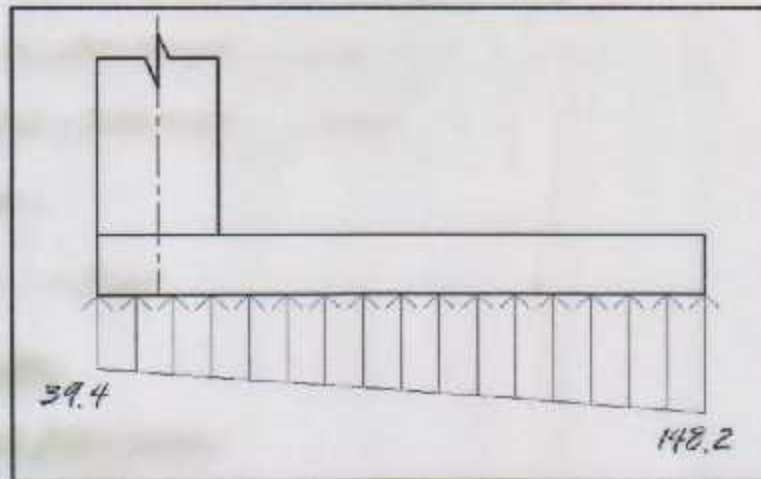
Contact Pressure diagram due to loading (factored) - Exterior frame footing
